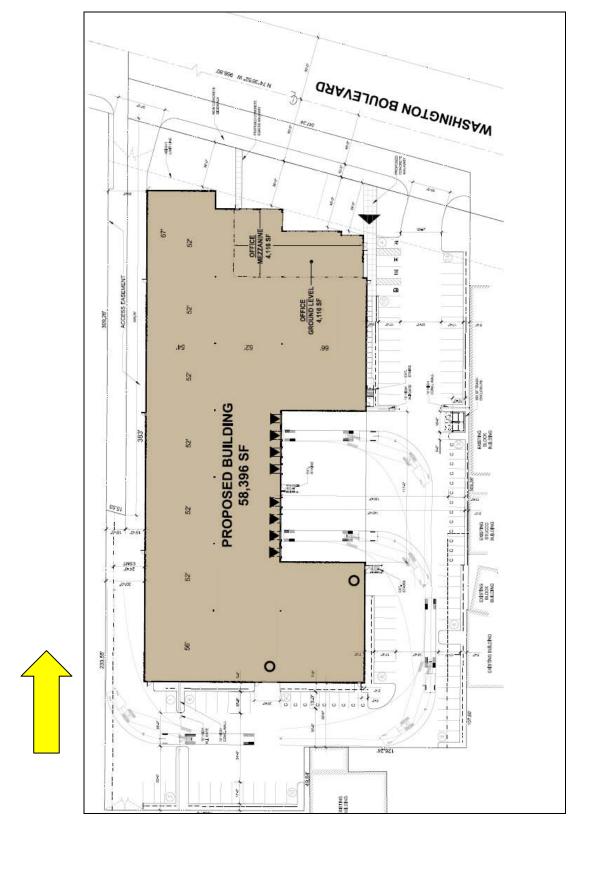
CONCEPTUAL SITE PLAN SOURCE: WARE MALCOMB
